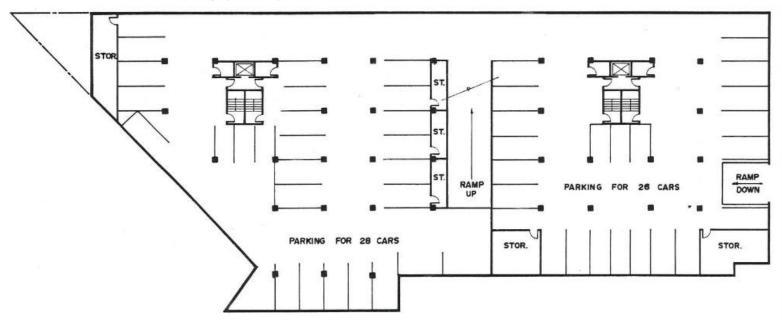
ORIGINAL PARKADE PLAN IN THE PUD ZONING AGREEMENT FOR THE LAND.
